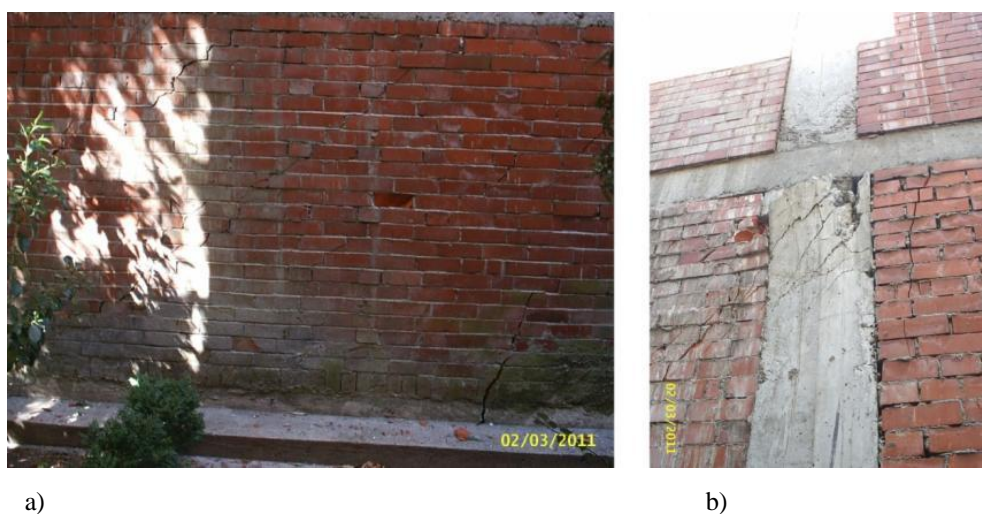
Observed damage on masonry infills after the 22nd February 2011 Christchurch earthquake: a) Sliding shear crack, b) Overall corner damage
